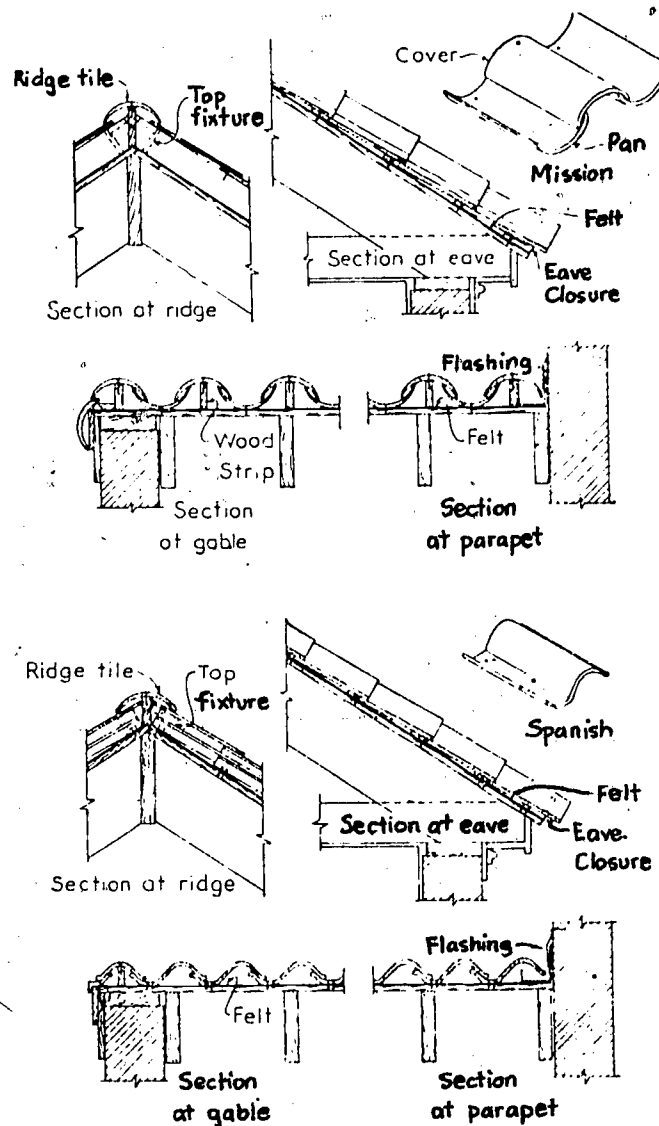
Typical tile roofs. Above. Two piece pan and cover, commonly known as Mission tile. Below. Spanish tile.
